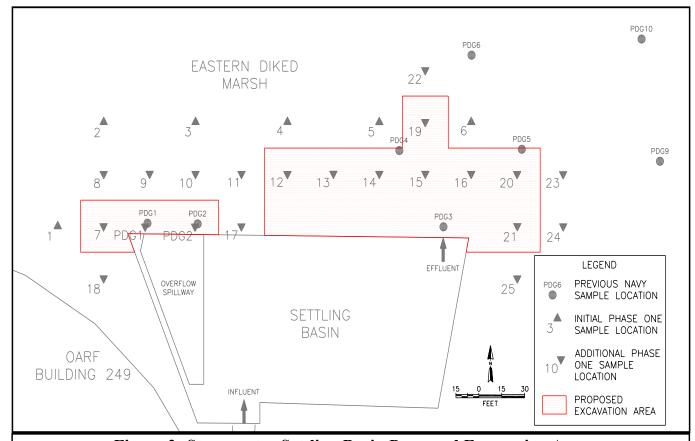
Stormwater Settling Basin Proposed Excavation Area
